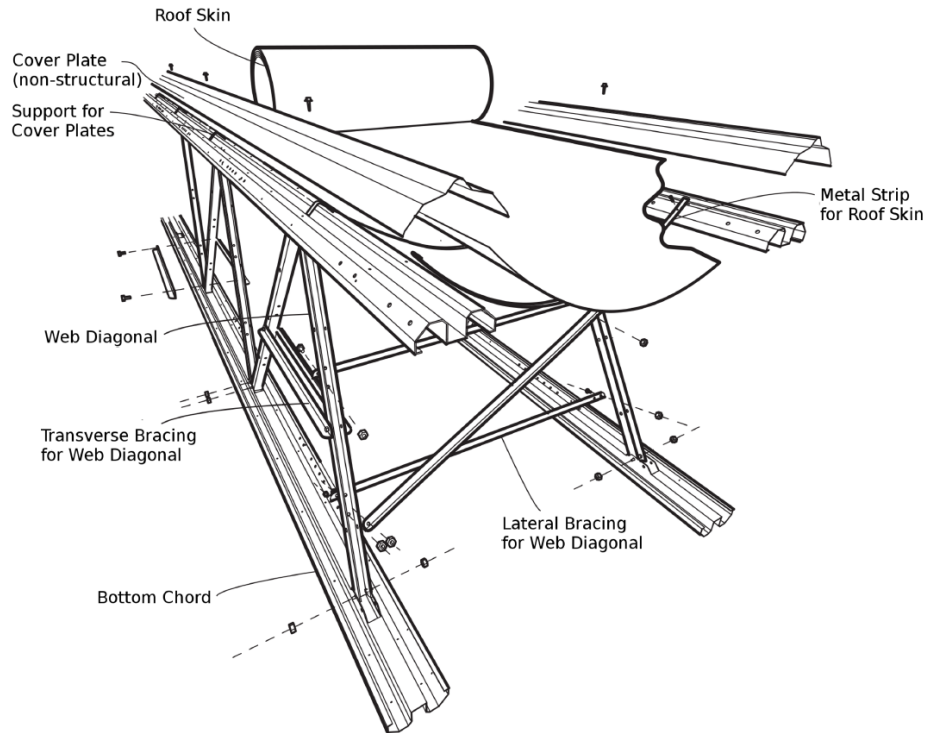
ISOMETRIC VIEW OF TRUSS MEMBERS
